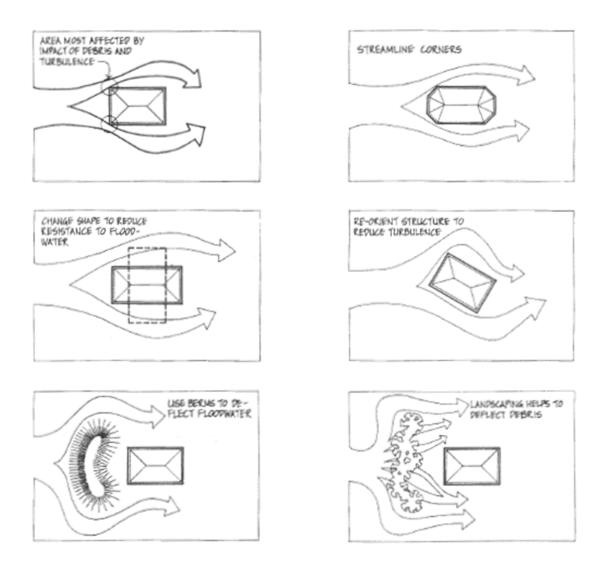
possible ways of building orientation in flood prone areas Approach 3: Lay out of buildings
